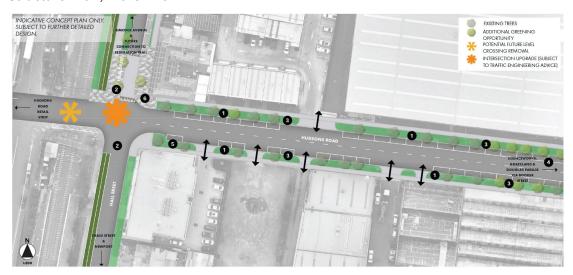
Hudsons Road East Indicative Concept from *Draft Spotswood Activity Centre Structure Plan, March 2022
